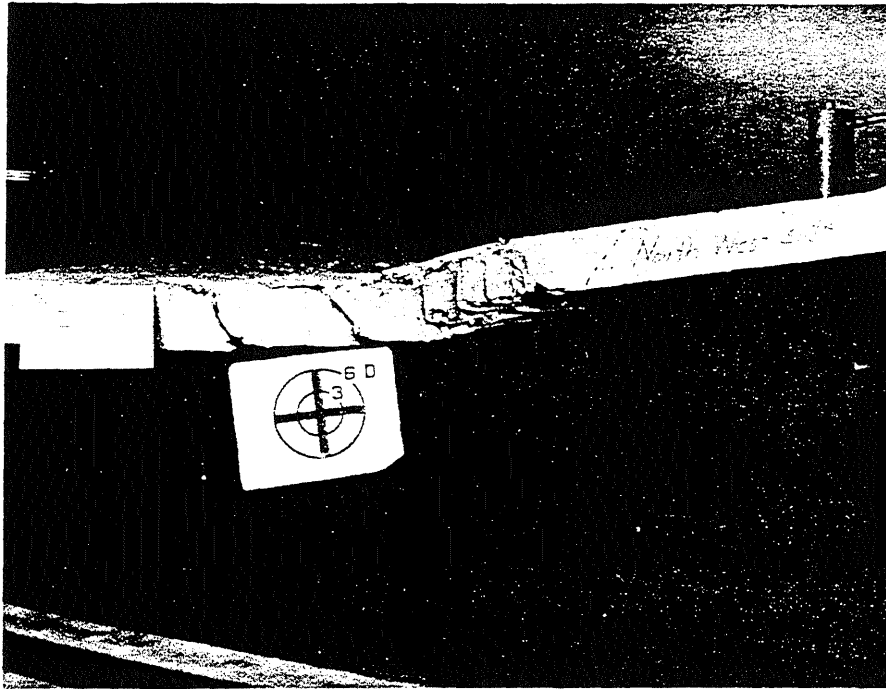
CRACK PATTERN IN BOTTOM SURFACE OF B15
